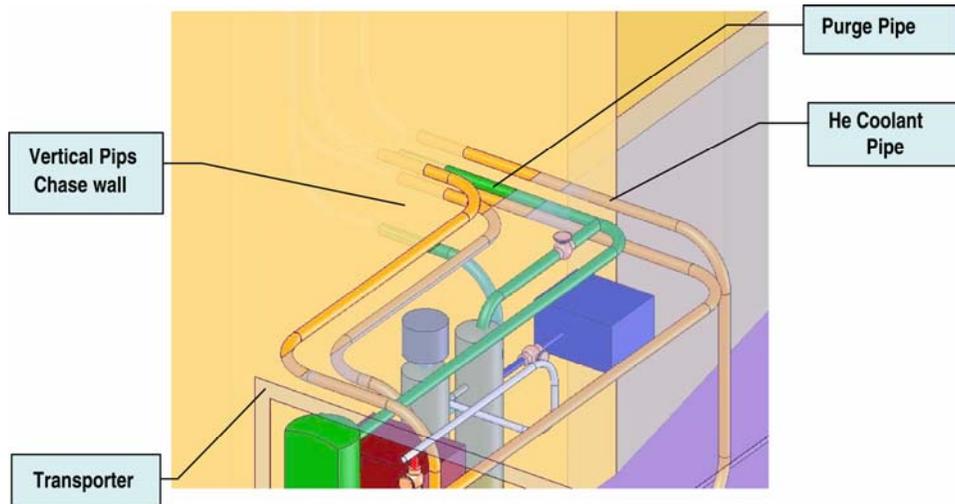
Transporter side wall pipe penetrations to vertical pipe chase area.
